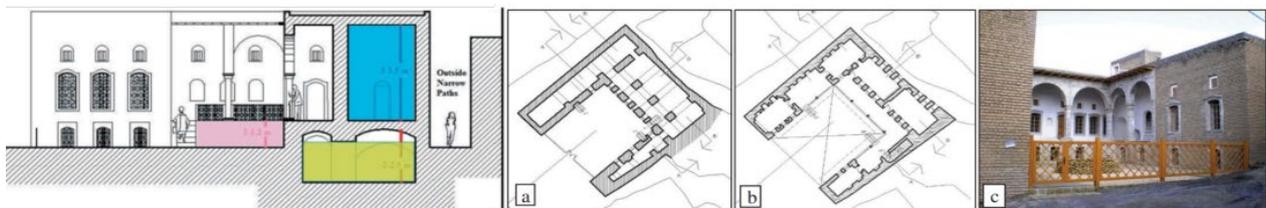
Detail of a heritage building in the citadel with historical value. (a) Basement floor plan. (b) Ground floor plan. (c) View of the building.
